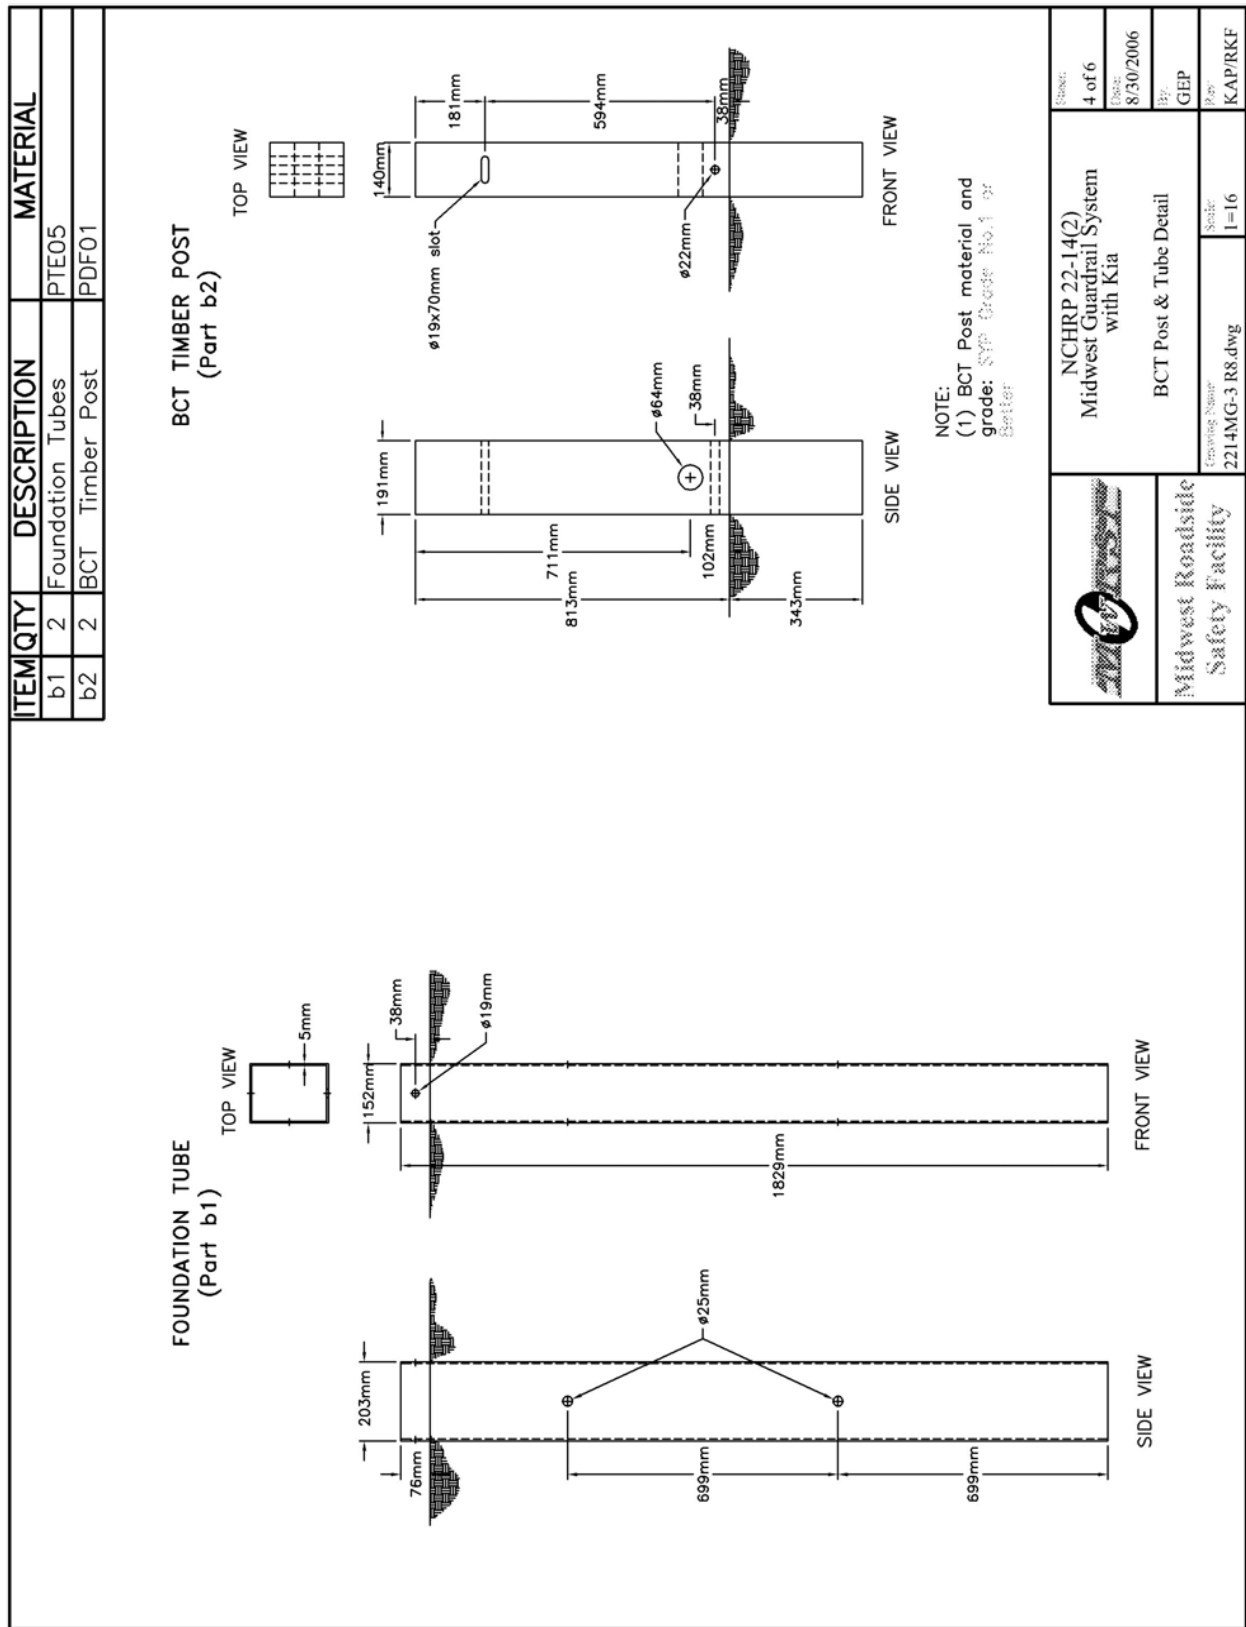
Midwest Guardrail System Anchorage Details - Maximum Height Tolerance
